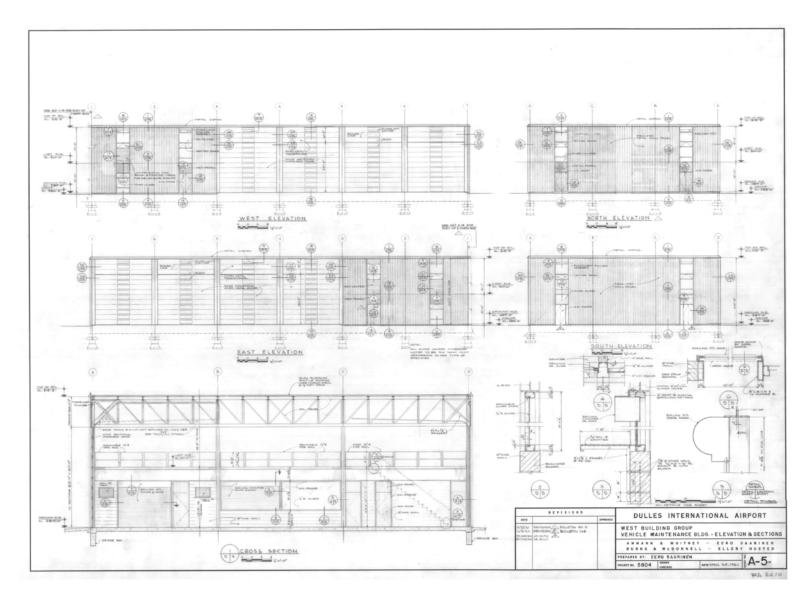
Shop 1 Building (April 14, 1961 - As Built Plans) Showing Existing Doors 1-4
